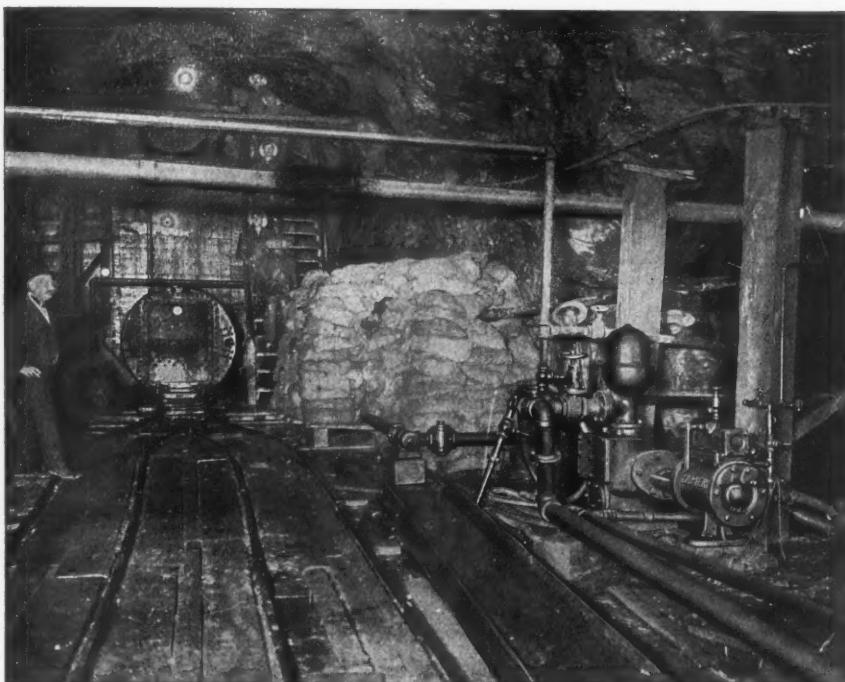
PUMPS IN TUNNEL WORKINGS.
